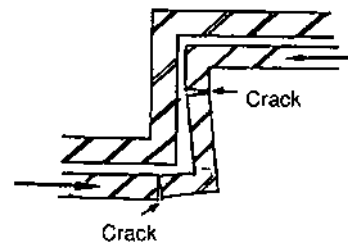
Typical differential movements between brickwork parapet and concrete frame
